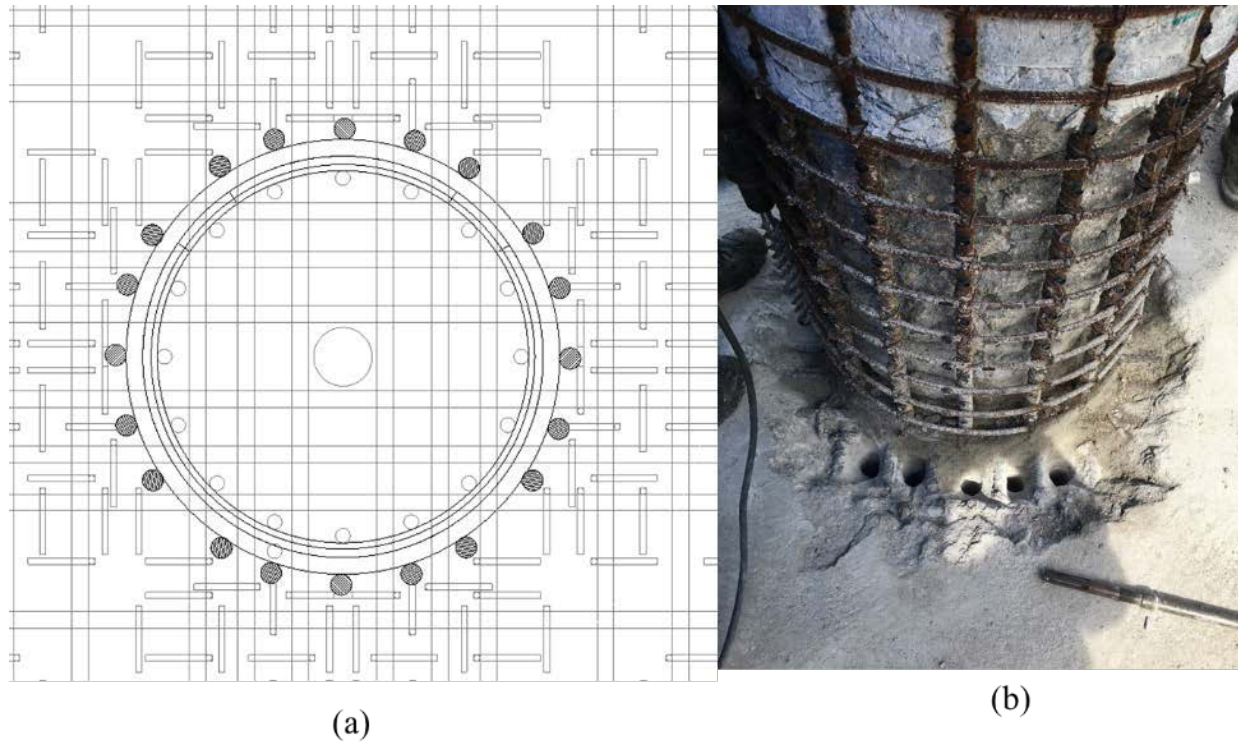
a) Anchor Location for C1 and C2 Column Specimens b) Drilled Holes for C2 Column Specimen
